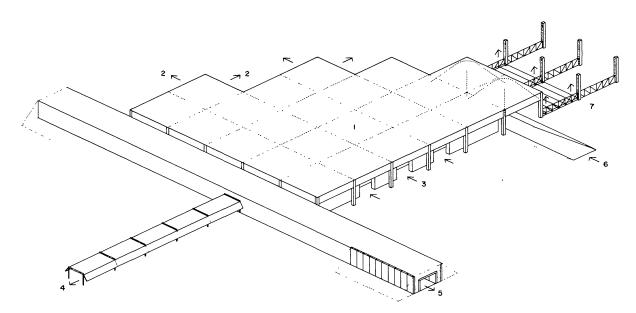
BASE CONCEPT I. Flat shield raised in sections, pressurized enclosures beneath. Overall view of base. (1) Regolith shielding. (2) Perimeter expansion. (3) Base entry through overlapping radiation barrier walls, from lunar surface equipment and installations "park." (4) Solar shaded links to other parts of base. (5) Shielded links to other parts of base. (6) Ramp access to lower levels. (7) Initial erection sequence.
